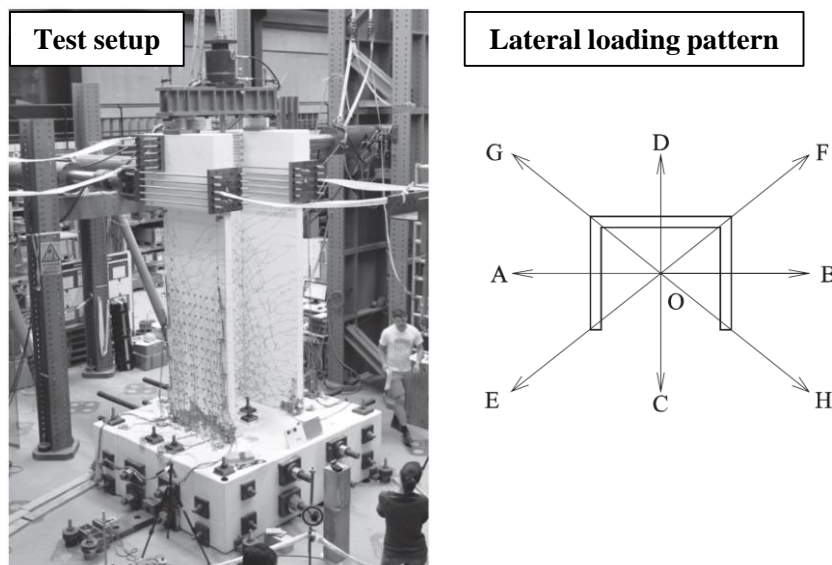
Photo of the test setup and the loading positions (Constantin and Beyer 2016)
